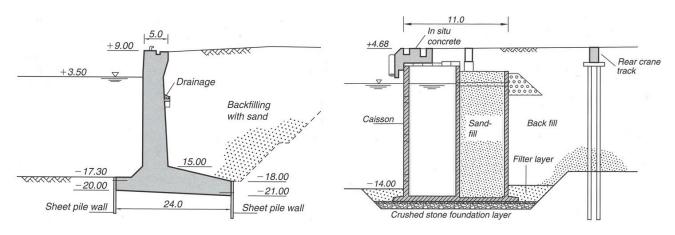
Two examples of gravity walls - shallow foundation (Quay walls, 2014)
